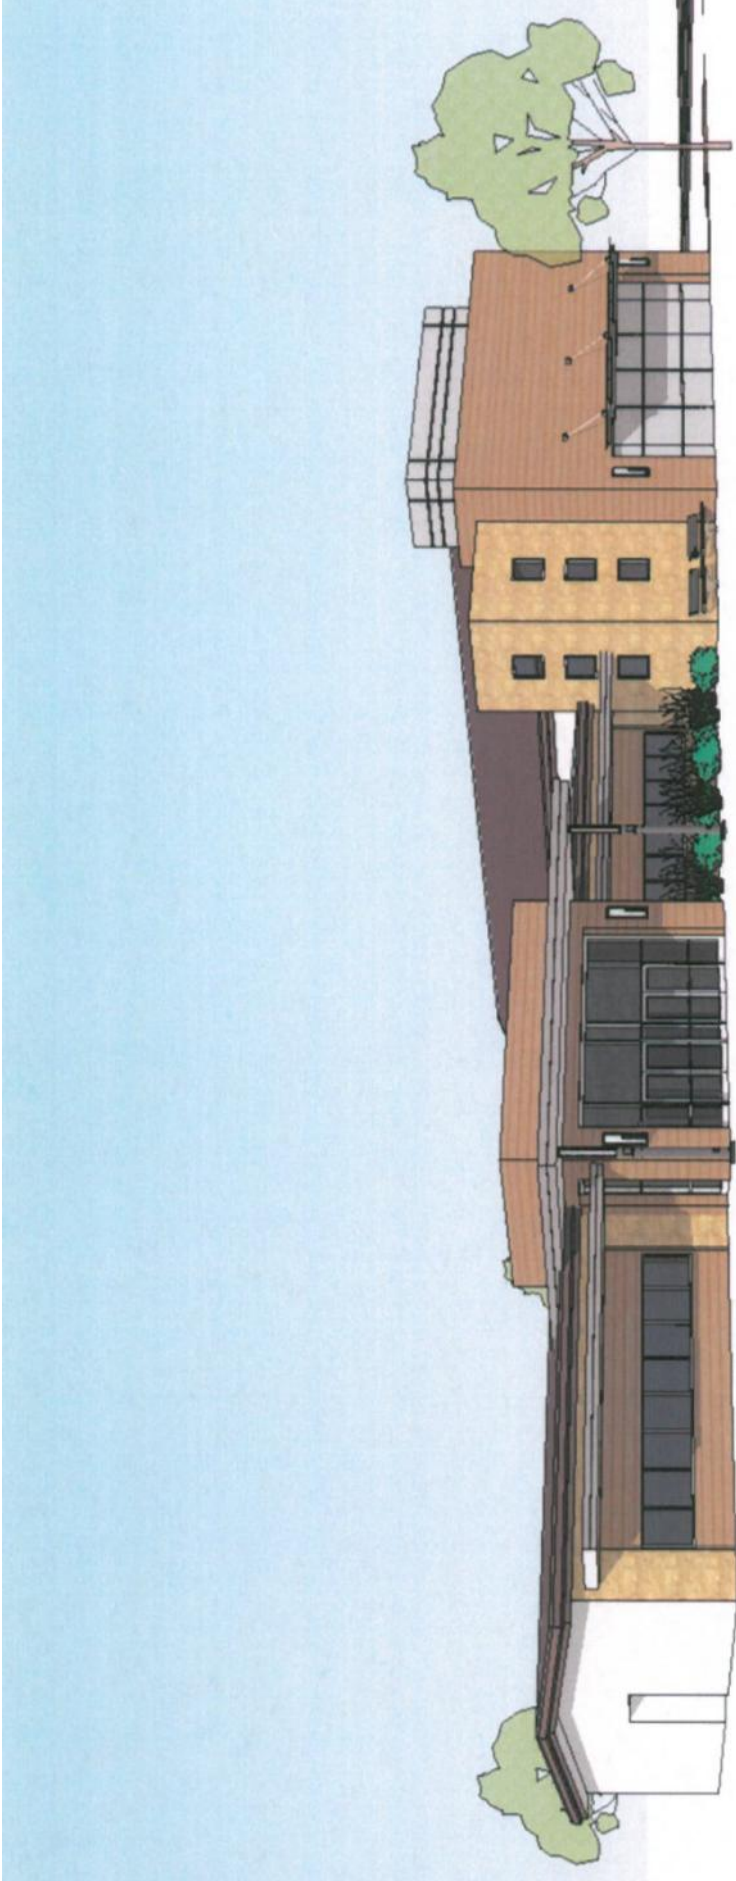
EXHIBIT F - PHASE 2 WEST ELEVATION RENDERING
